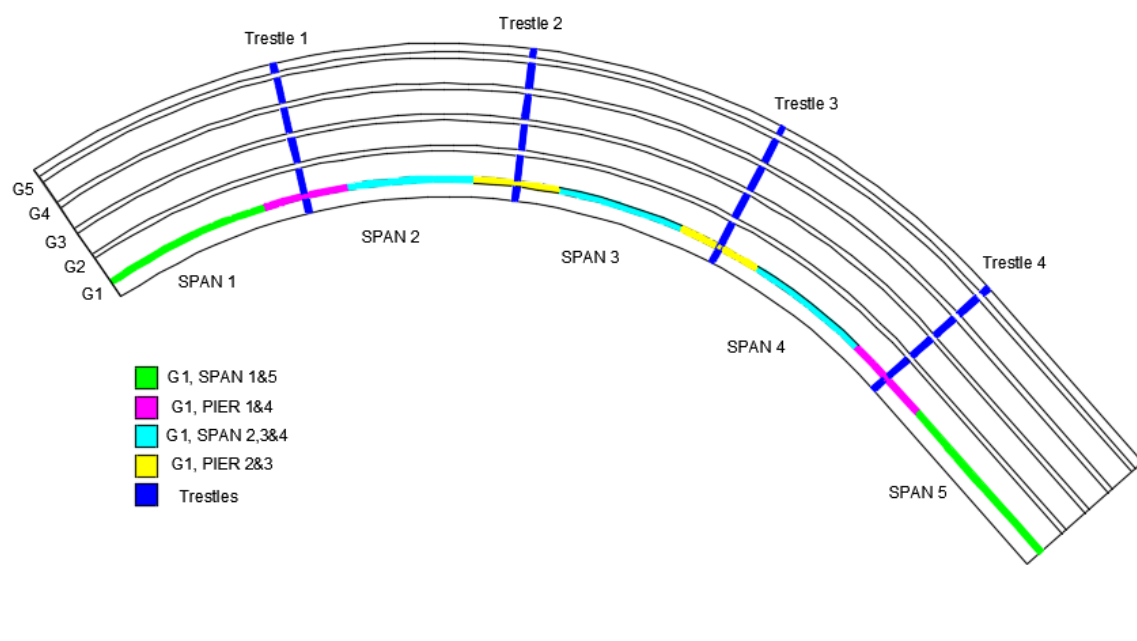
Illustration of the different sections of the Girders (Top Plan of Ashworth Viaduct)
